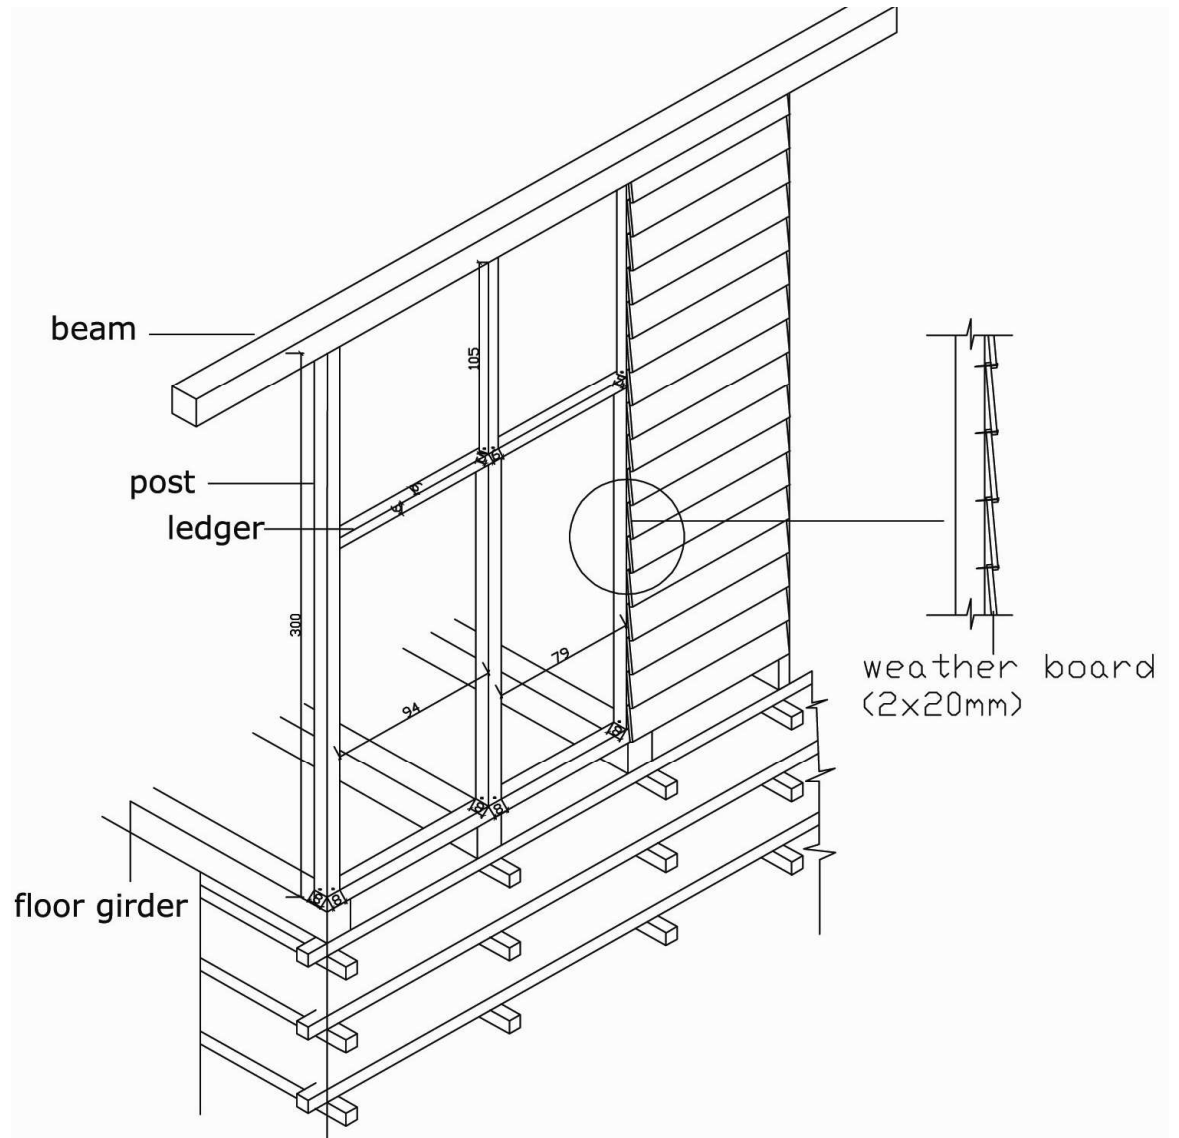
22 Drawing of the timber wall type 4. Çelik 2008.
